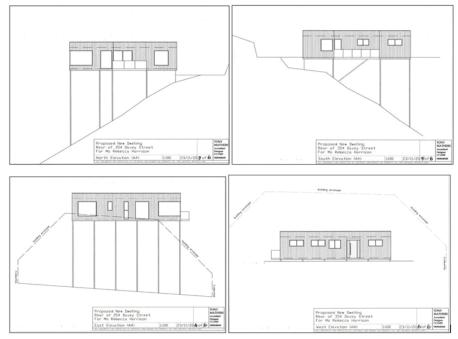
Proposed elevations - North and south side elevations at top, east and west rear and front elevations at bottom.
